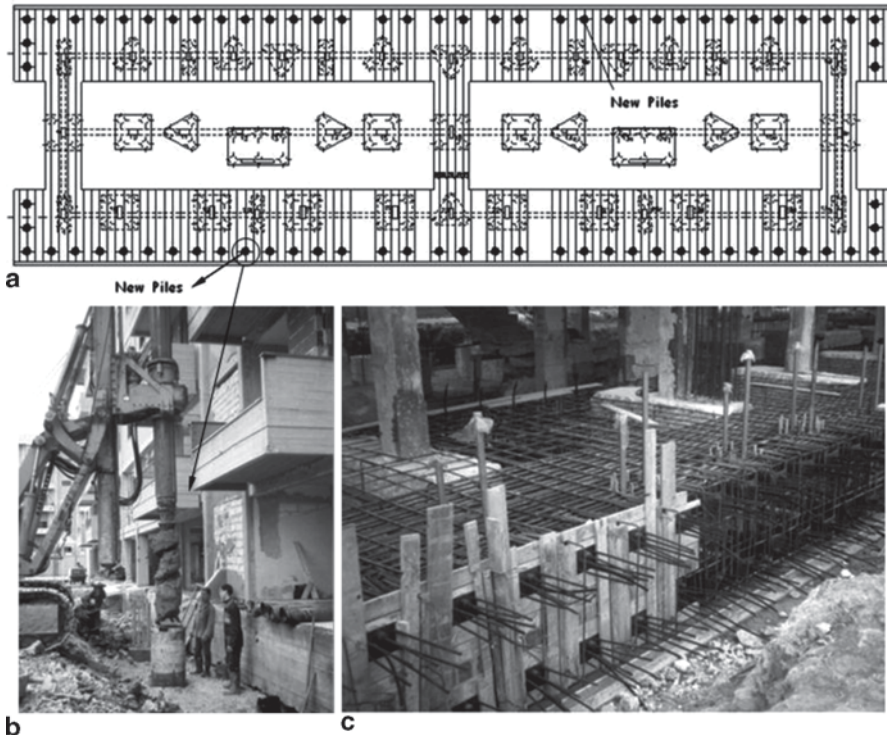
Piled foundation with new piles. a Plan view. b Pile drilling. c Foundation enlargement
